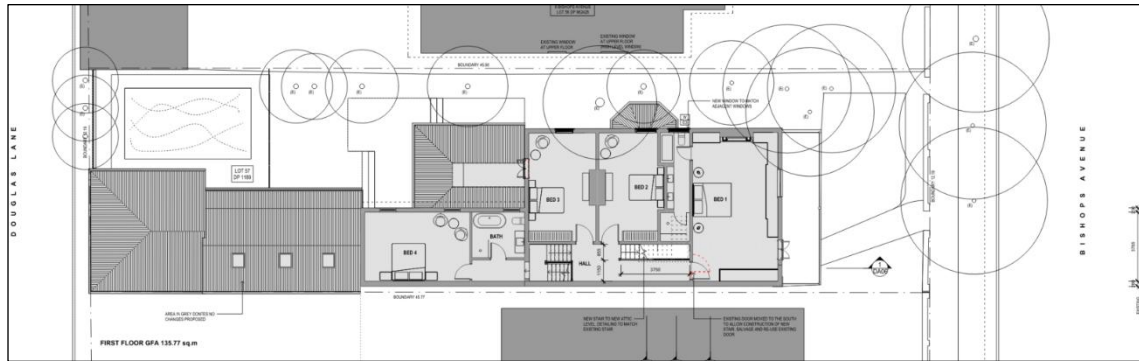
Extracted from First Floor Plan (Source: Source Architects Pty Ltd)
